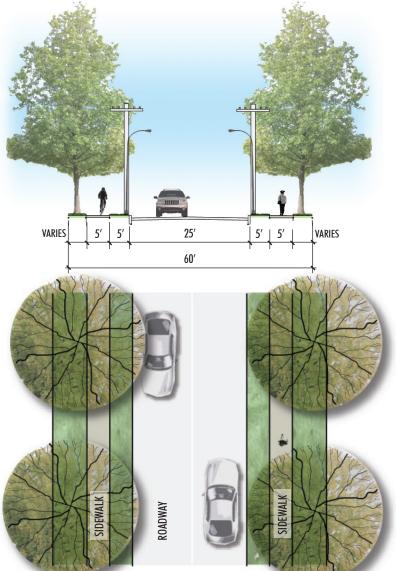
The Hub: Zone 2 Existing Conditions Section and Plan
